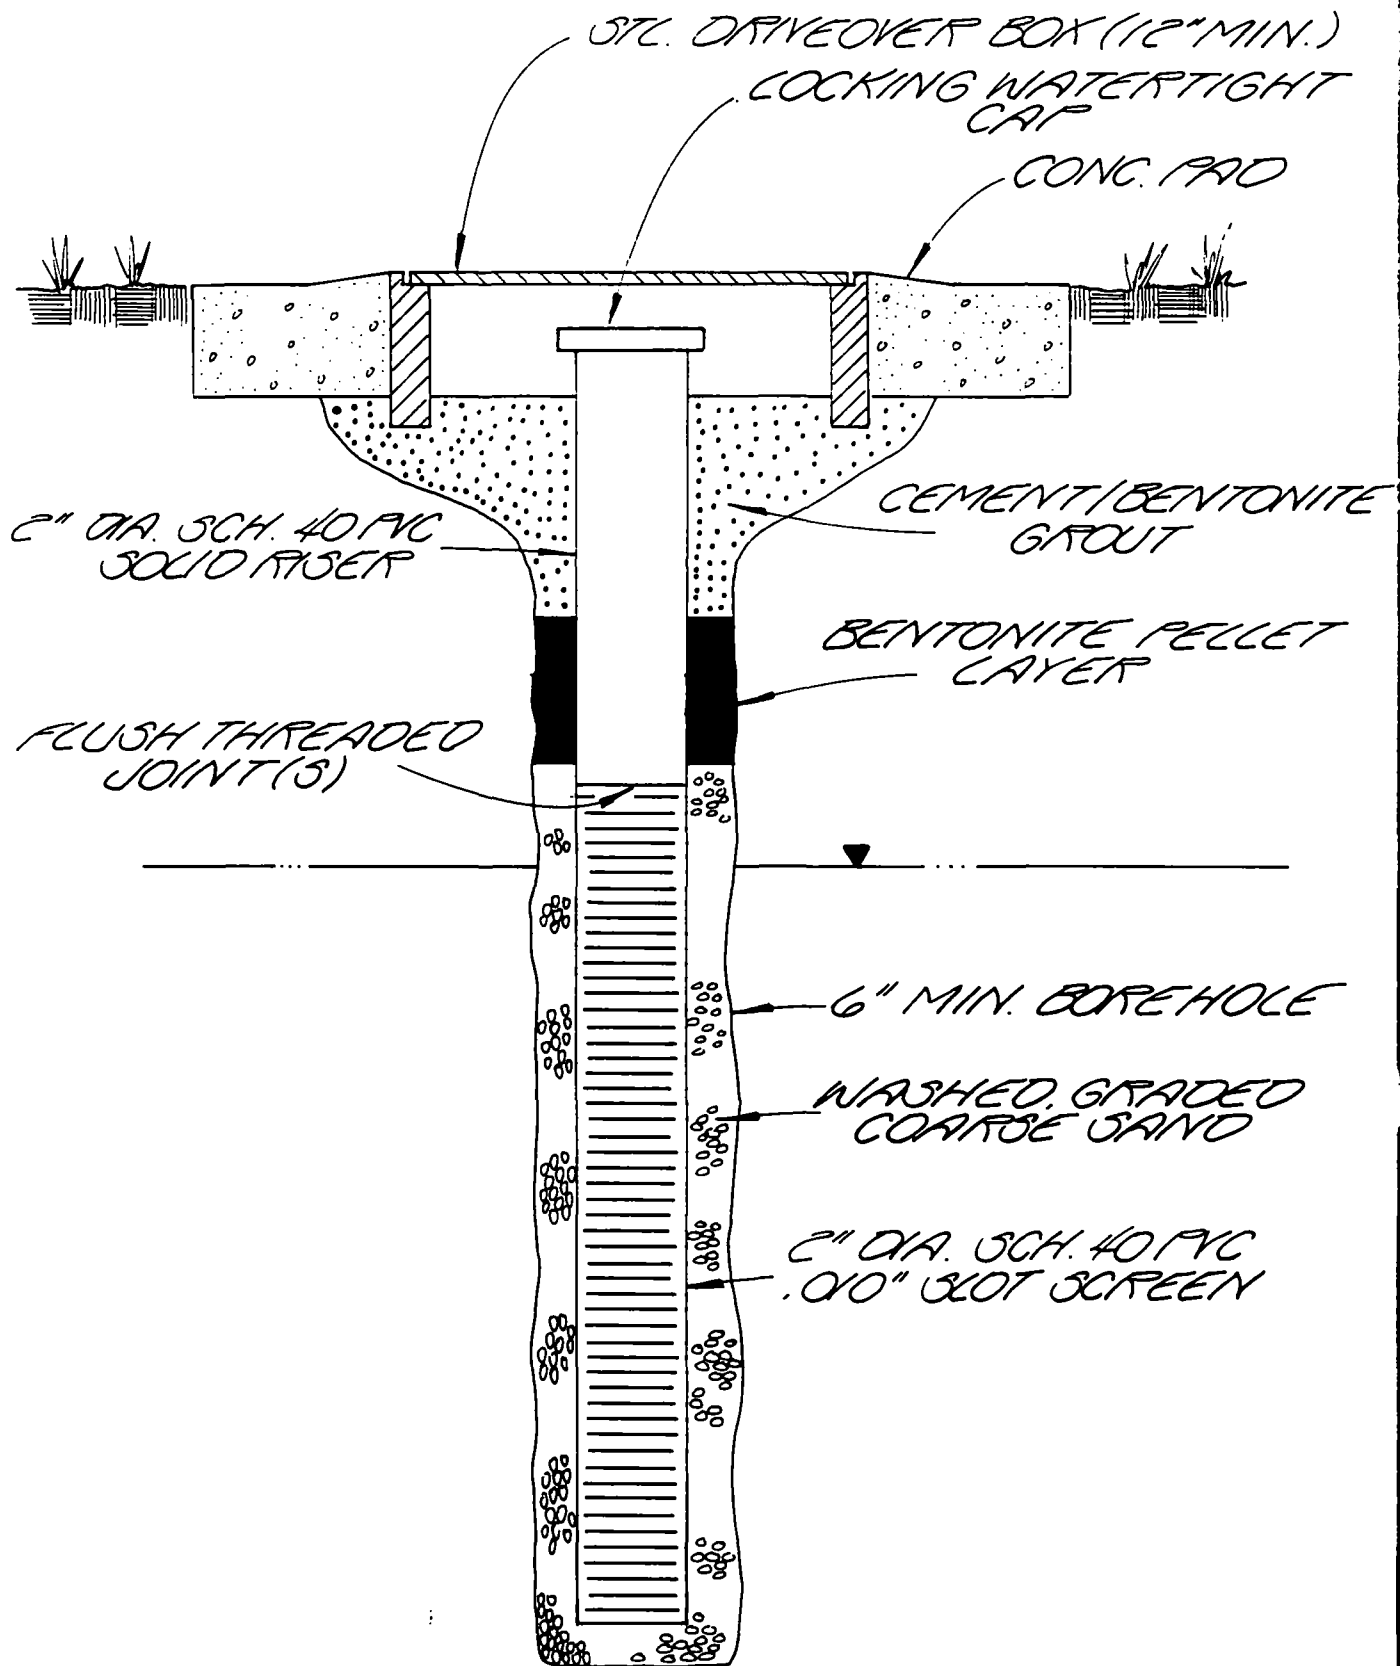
TYPICAL AT-GRADE MONITORING-WELL CONSTRUCTION
